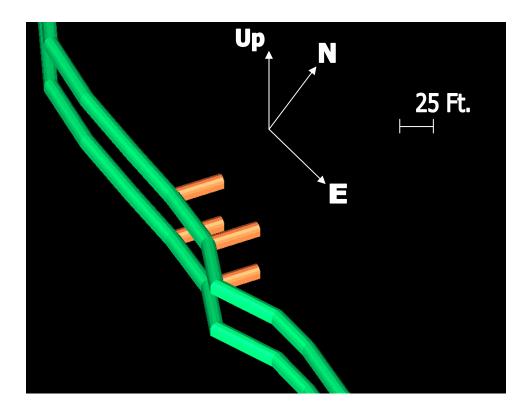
Development of Access Drifts and Stope Access Crosscuts
